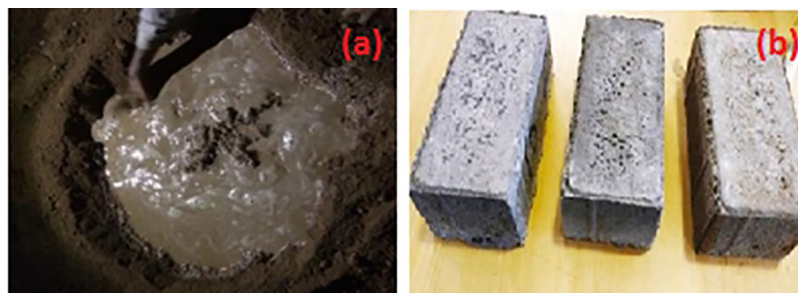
Specimen preparation (a) mixing of clay, ceramic powder and sugarcane bagasse ash and (b) brick specimen.
